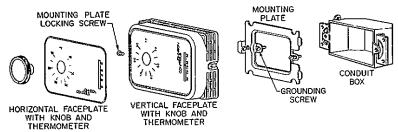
Line drawing illustrating method of mounting a vertical thermostat to a horizontal outlet box and installing a horizontal faceplate.
